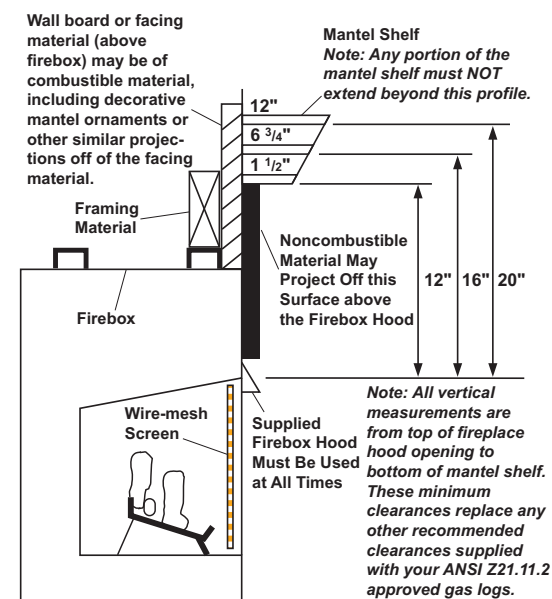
Minimum Mantel Clearances for Built-In Installation
